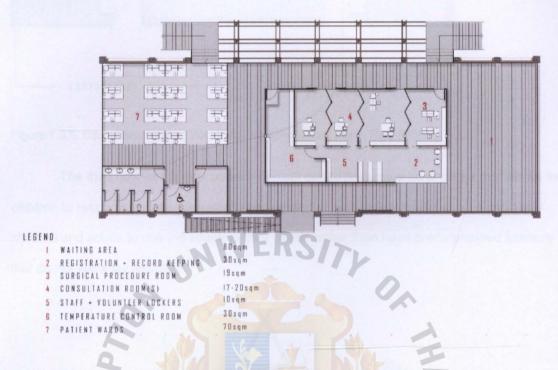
Medical center (Clinic and medical wards) floor plan -First floor
